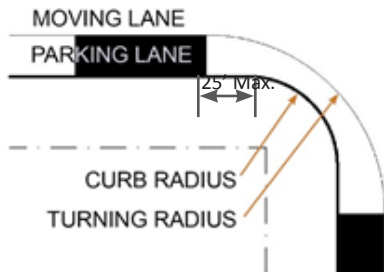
CURB RADI the curb radius between 20 feet and 30 feet maximum.
